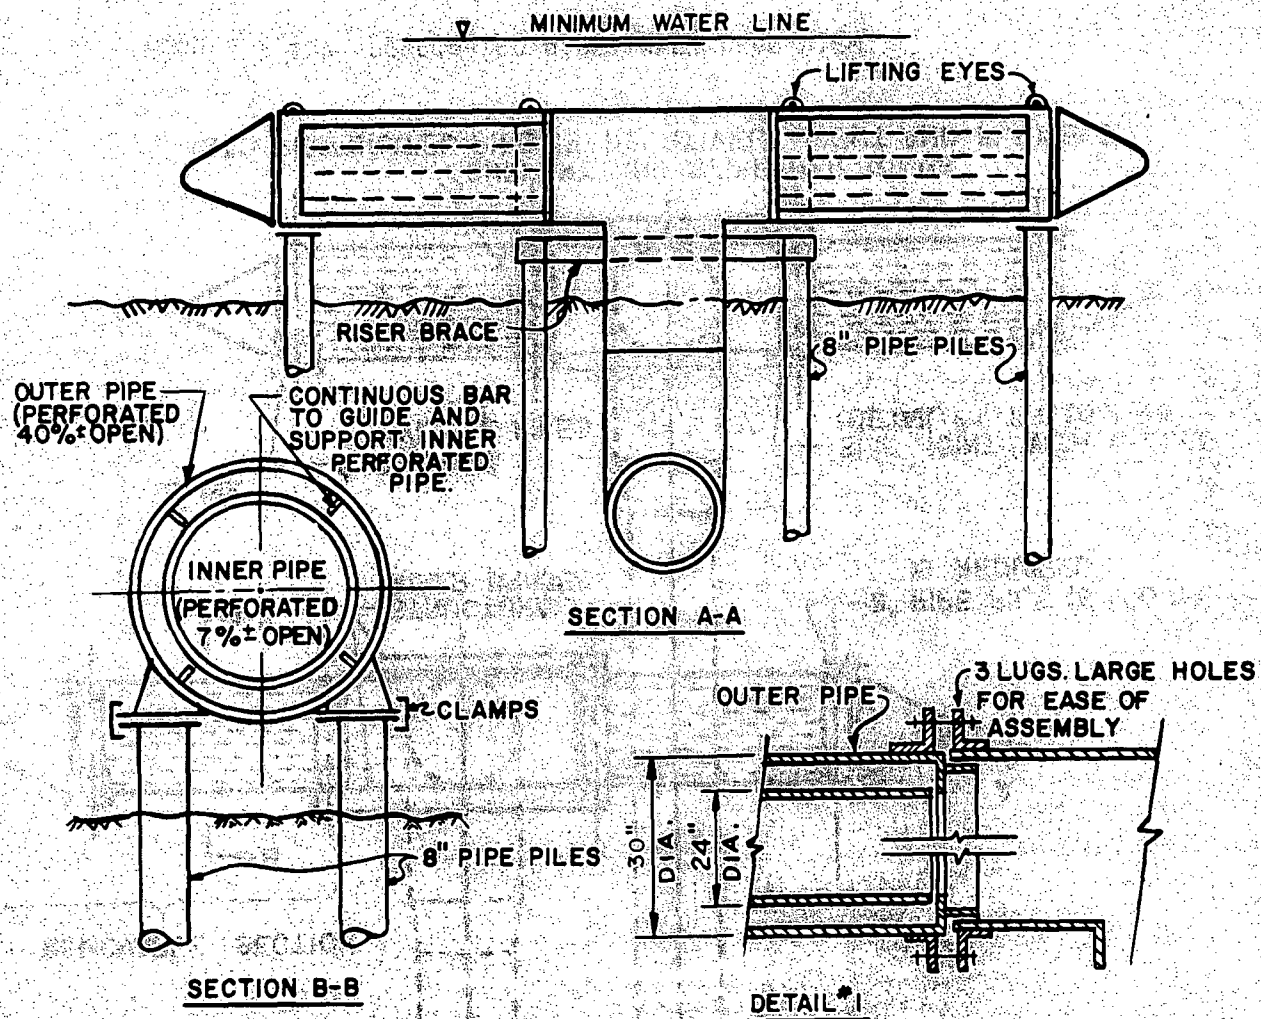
PERFORATED PIPE INLET SECTIONAL VIEW
